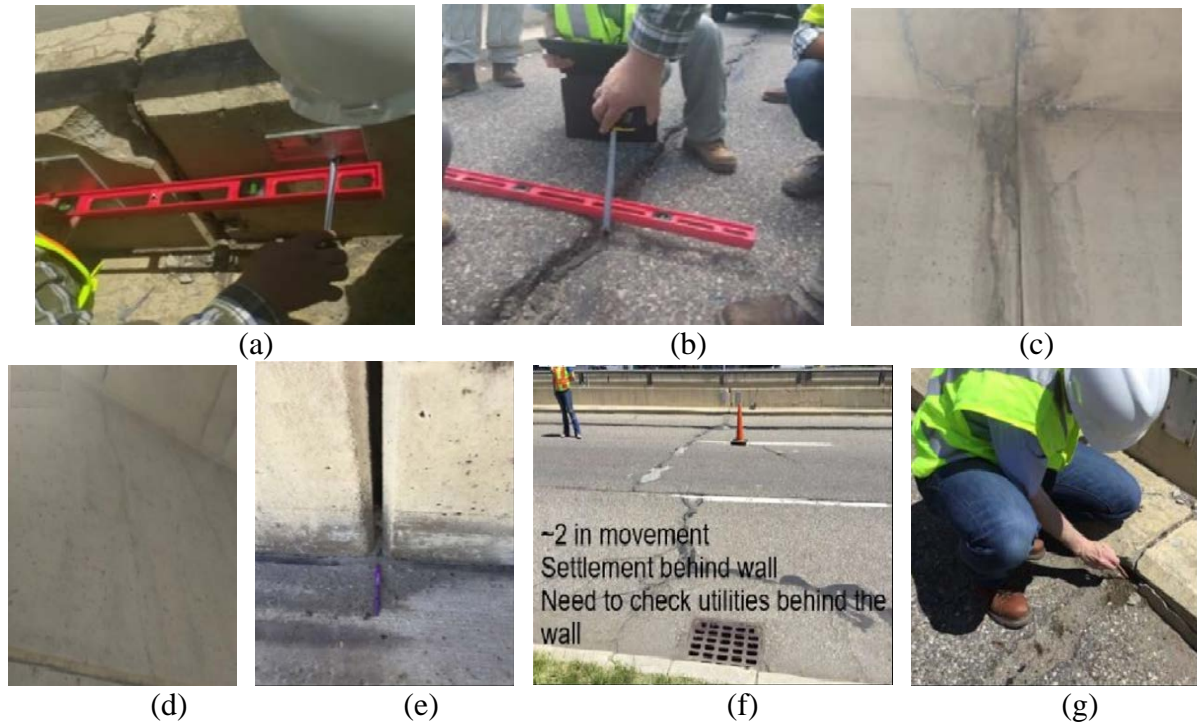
M-10 retaining wall system distress (June 2017): (a) wall tilting observed at the wall top; (b) severe lateral cracking of the service road pavement; (c) leakage stains on the wall face at the top of the wall; (d) vertical cracking of the wall face; (e) joint movement between wall panels; (f) distress of storm water pipe behind the wall; and (g) backfill soil evident at the wall joints.
